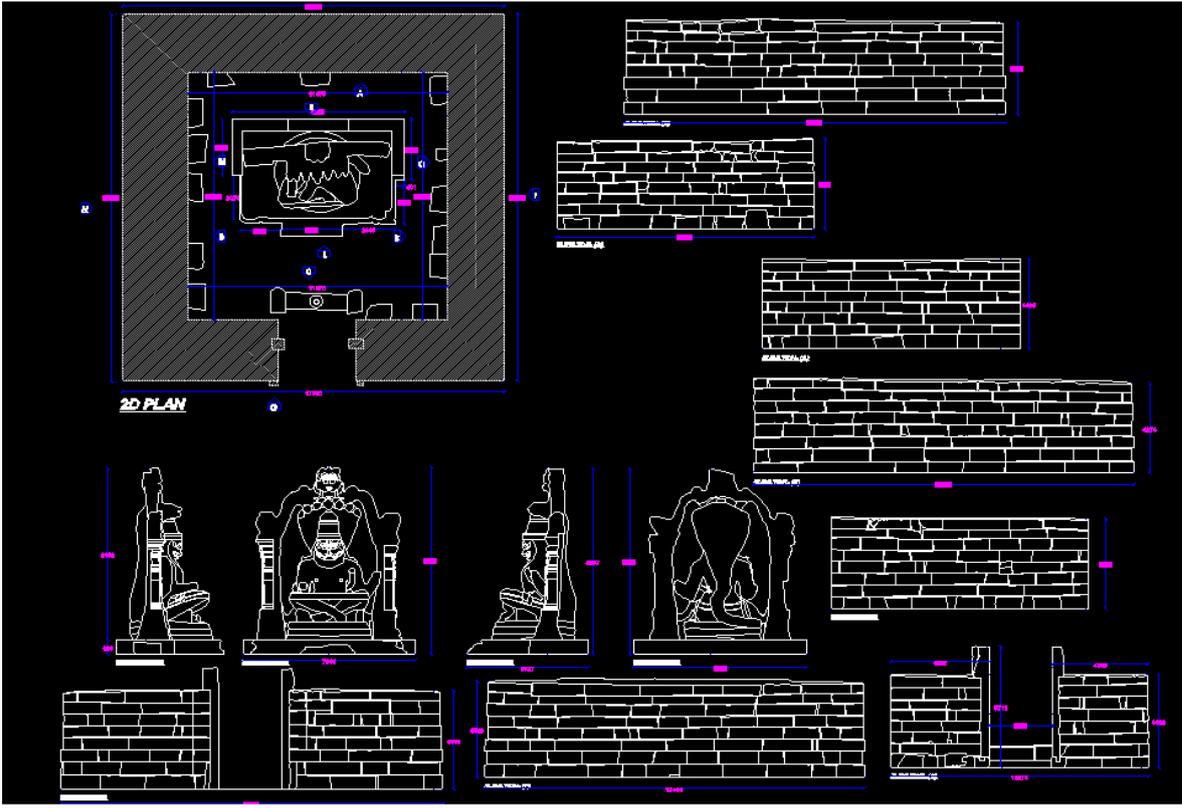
Engineering drawings- Plan and cross sections of Lakshmi narasimha statue
